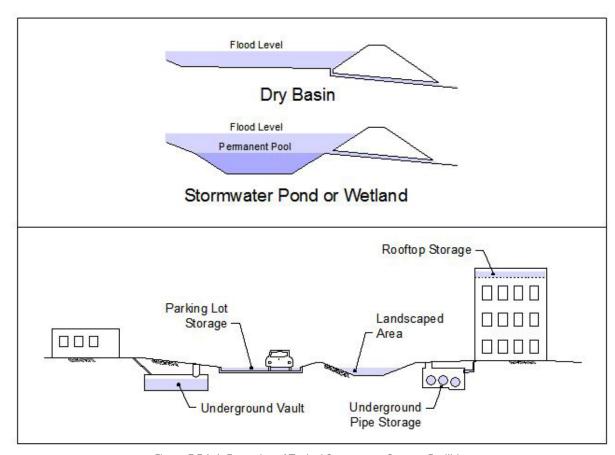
Examples of Typical Stormwater Storage Facilities
